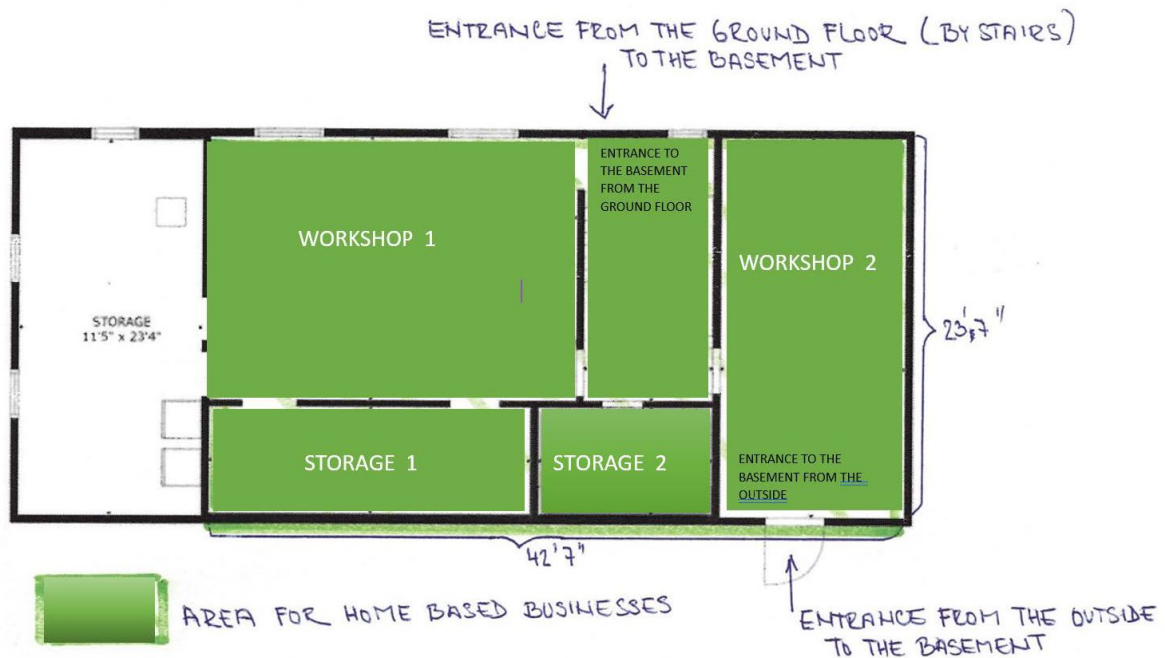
Basement Floor Plan showing area used for the Home Based Business
